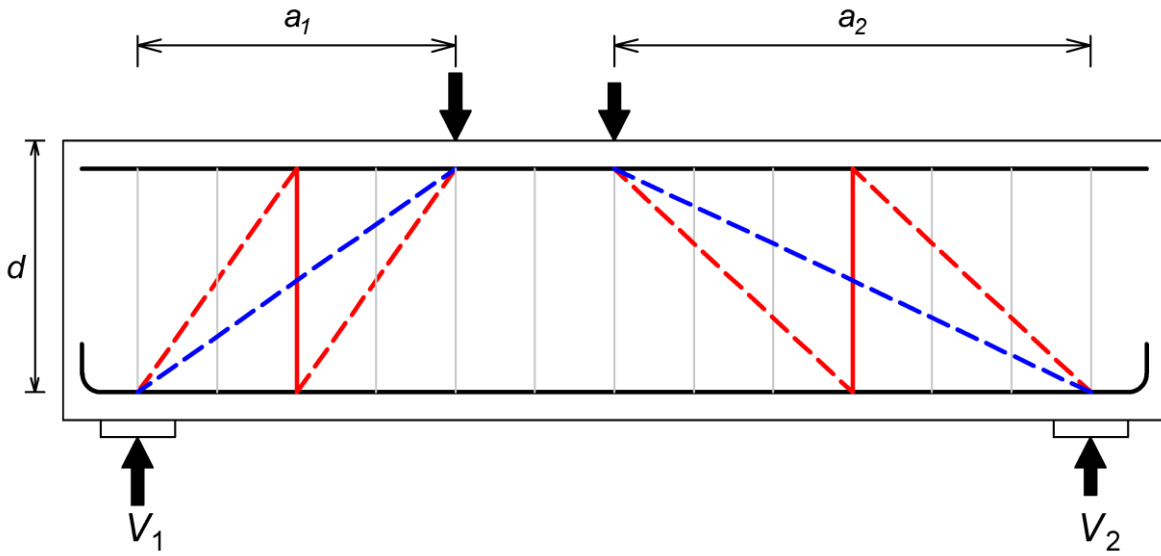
presents the structural modeling basis for the *TAMU* approach. As mentioned, following cracking, a truss-like structure forms by a diagonal concrete compression arch tied by steel reinforcement. The shear mechanism of the truss is associated with a load transfer path. In this
